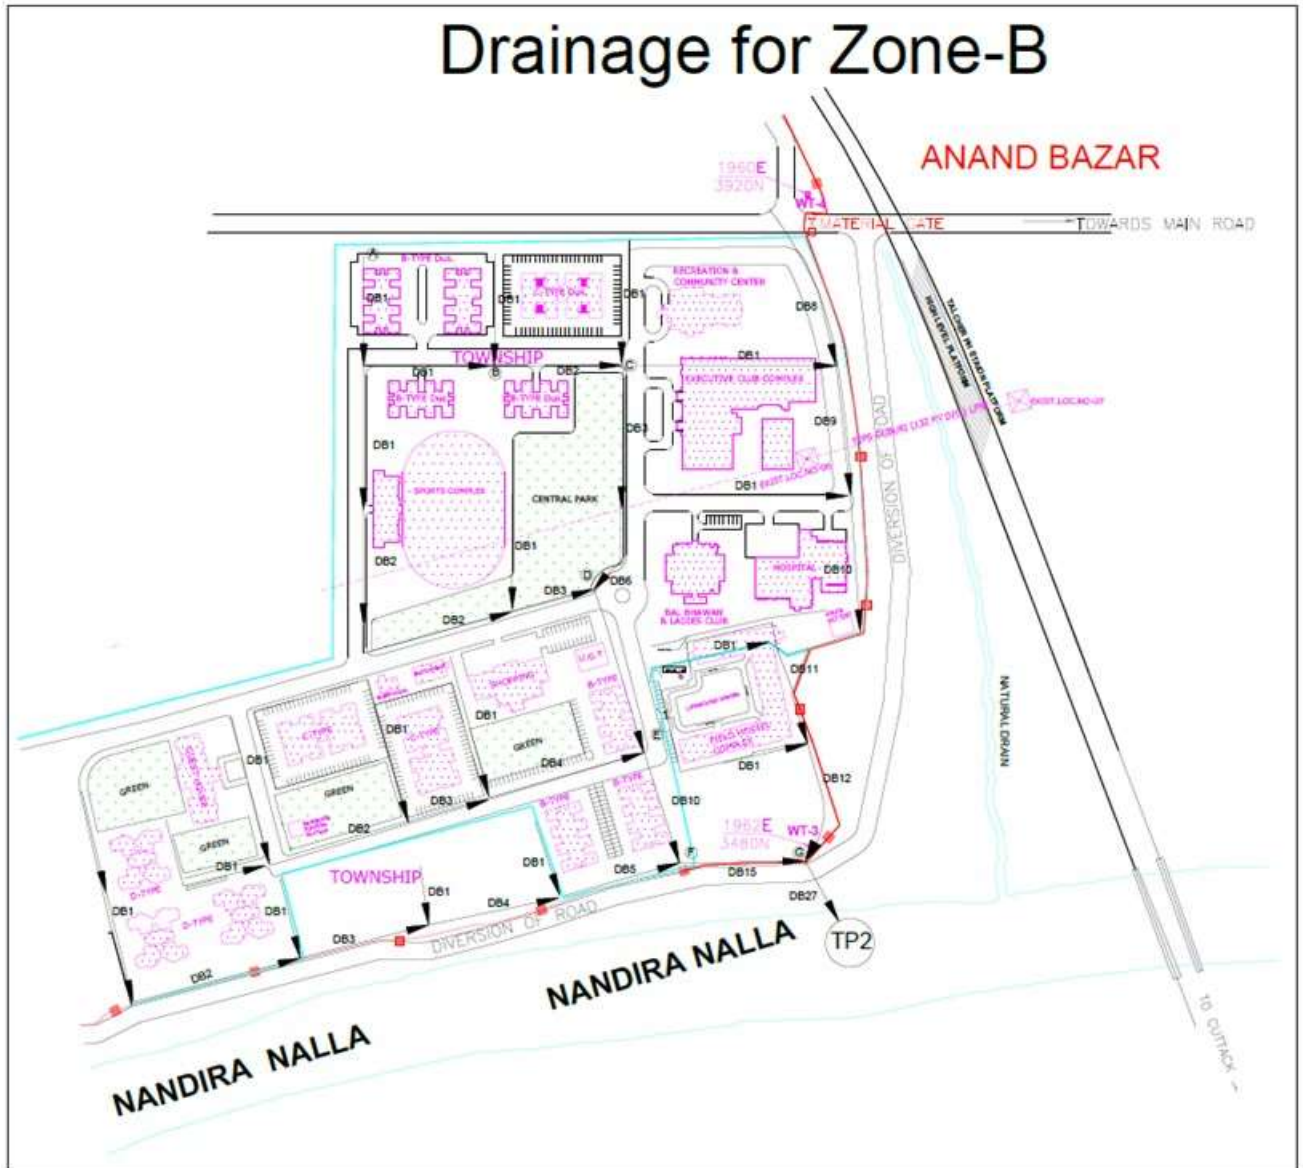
B Zone drainage plan showing drains, longest flow path and outfall location
